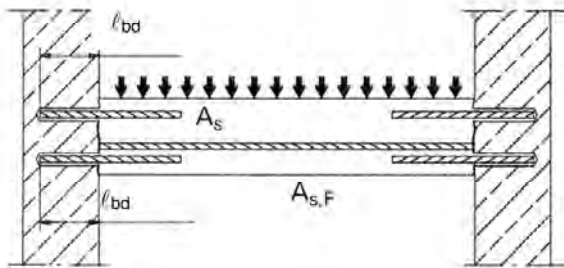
Overlapping joint for rebar connections of slabs and beams
